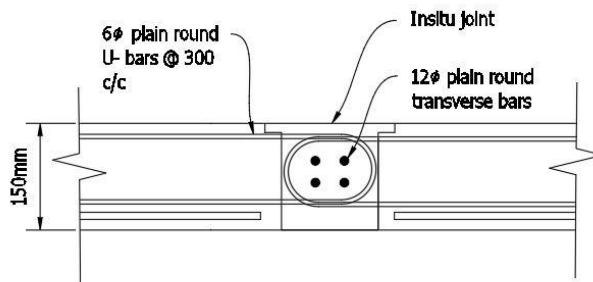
Floor to floor joint in hallway (no cross wall present)
